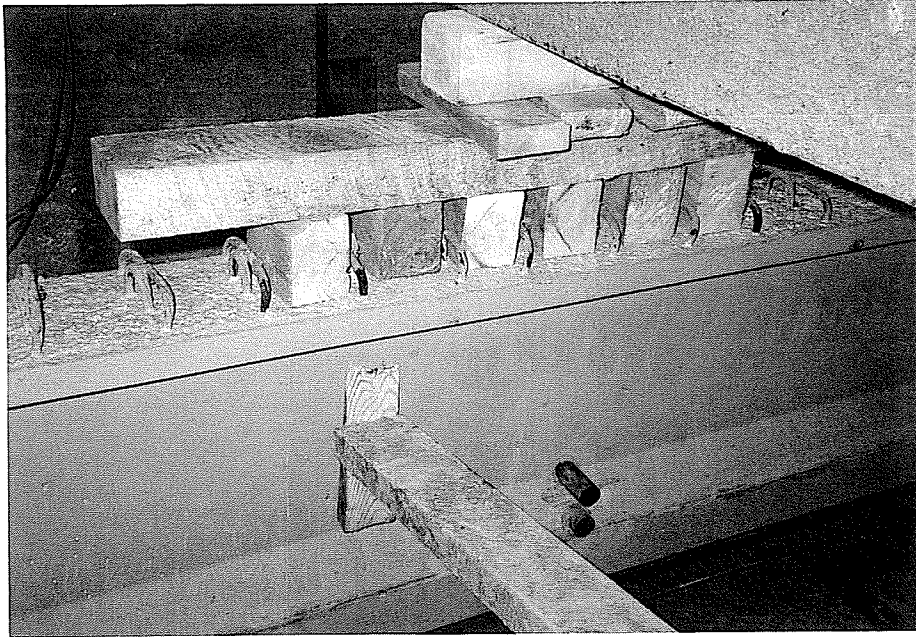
Supporting the girder downward at pin locations before releasing the form
